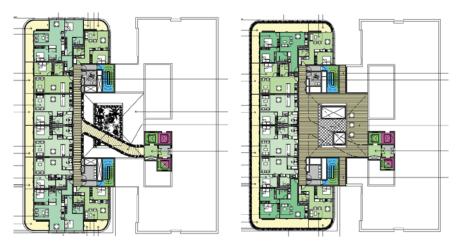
Extent of balconies (typical floor –left, level 11 - right) – shown in yellow *Source: Foster + Partners
